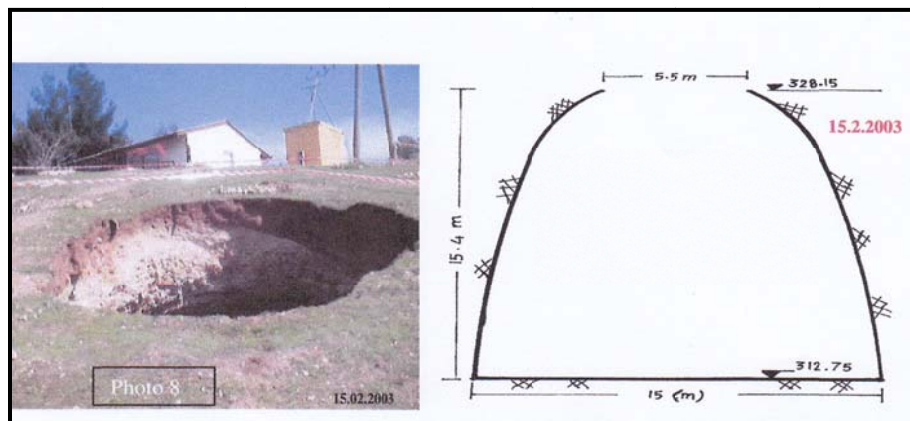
Photographs of the right bank sinkhole showing development stages and sketch indicating mapped dimensions [9].
